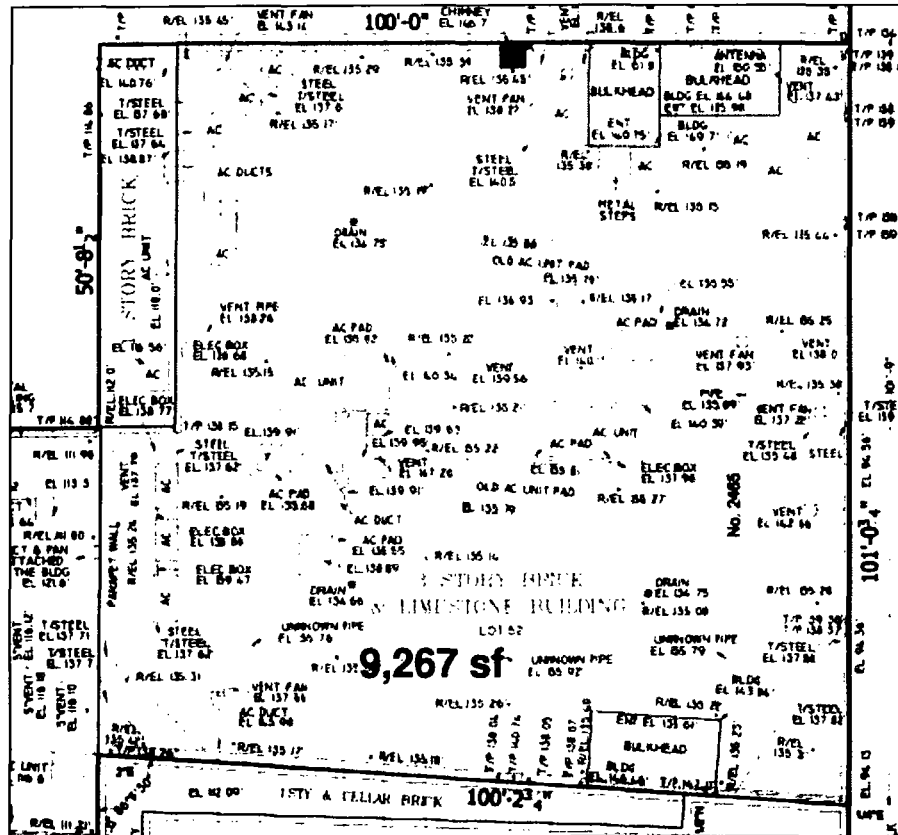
Area top view of the building underneath the 2461 Broadway cantilever
